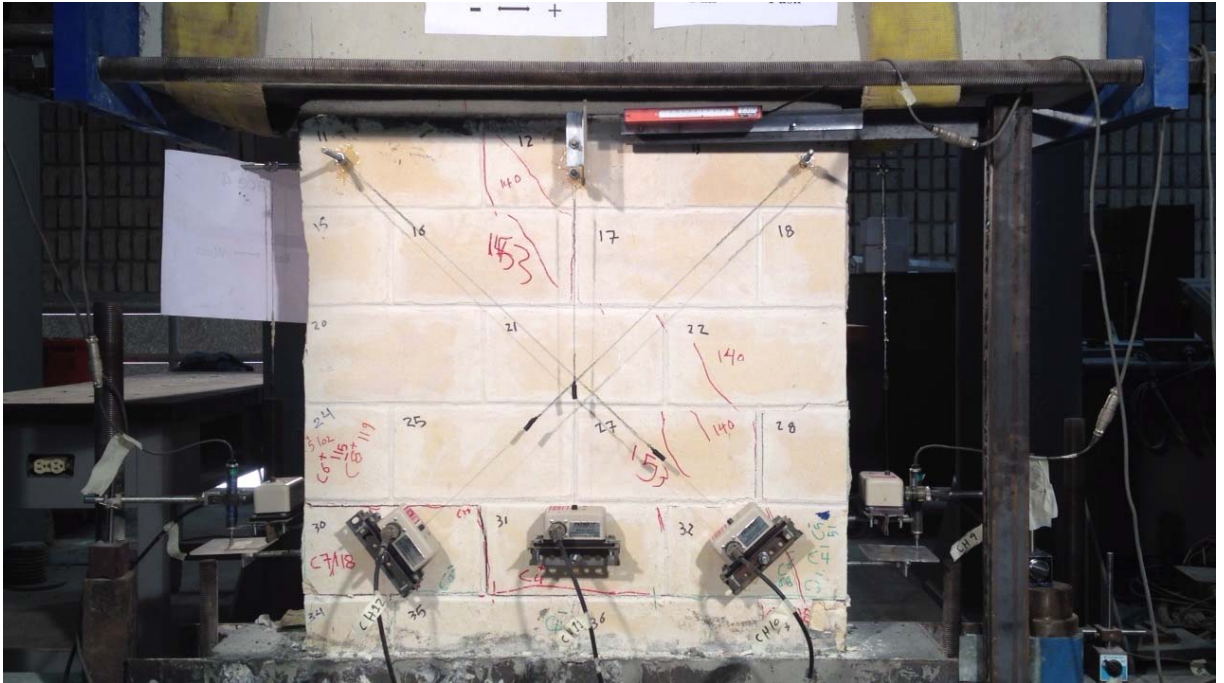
Damage associated with 7.3 mm push loading, Wall-1.35
